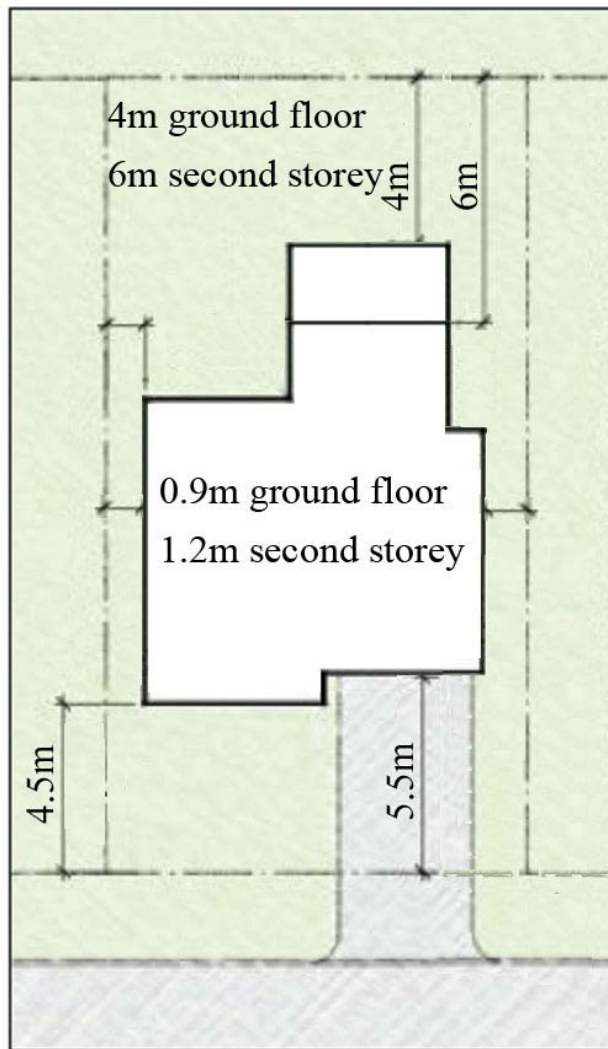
Example of Ground Floor & Second Storey Minimum Setbacks
